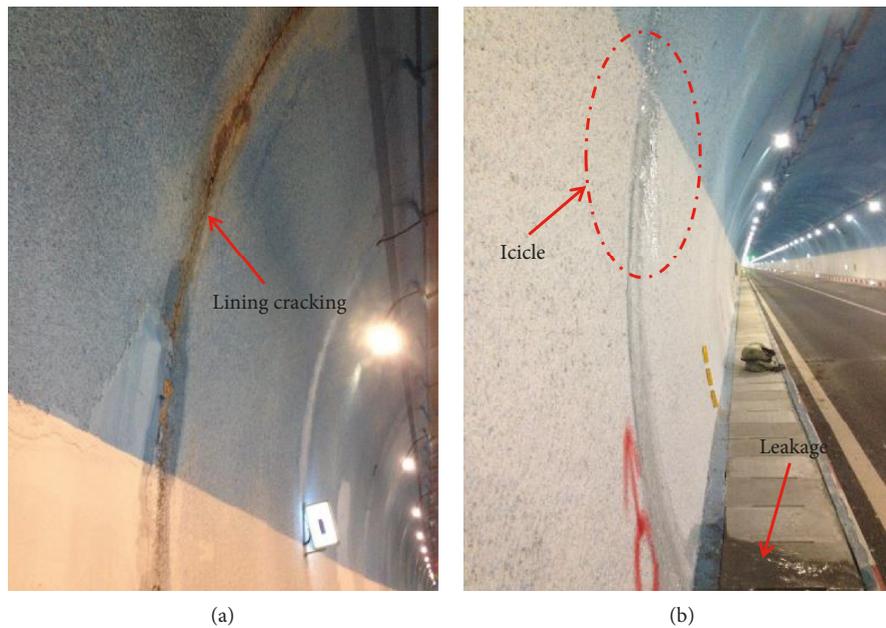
Tunnel frost damage in the sections without thermal insulation layer. (a) Near section K629 + 091. (b) Near section K630 + 490.
